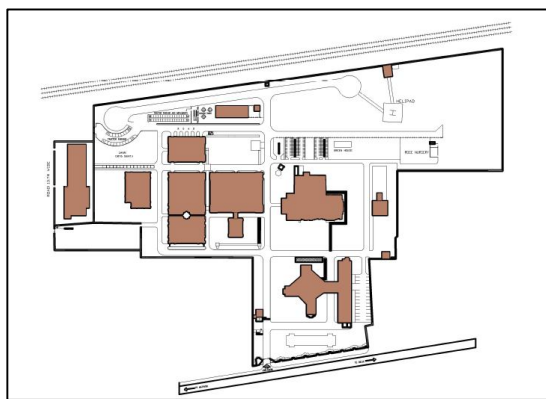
Site plan of project area. Source: M/S Escorts Pvt. Ltd.
